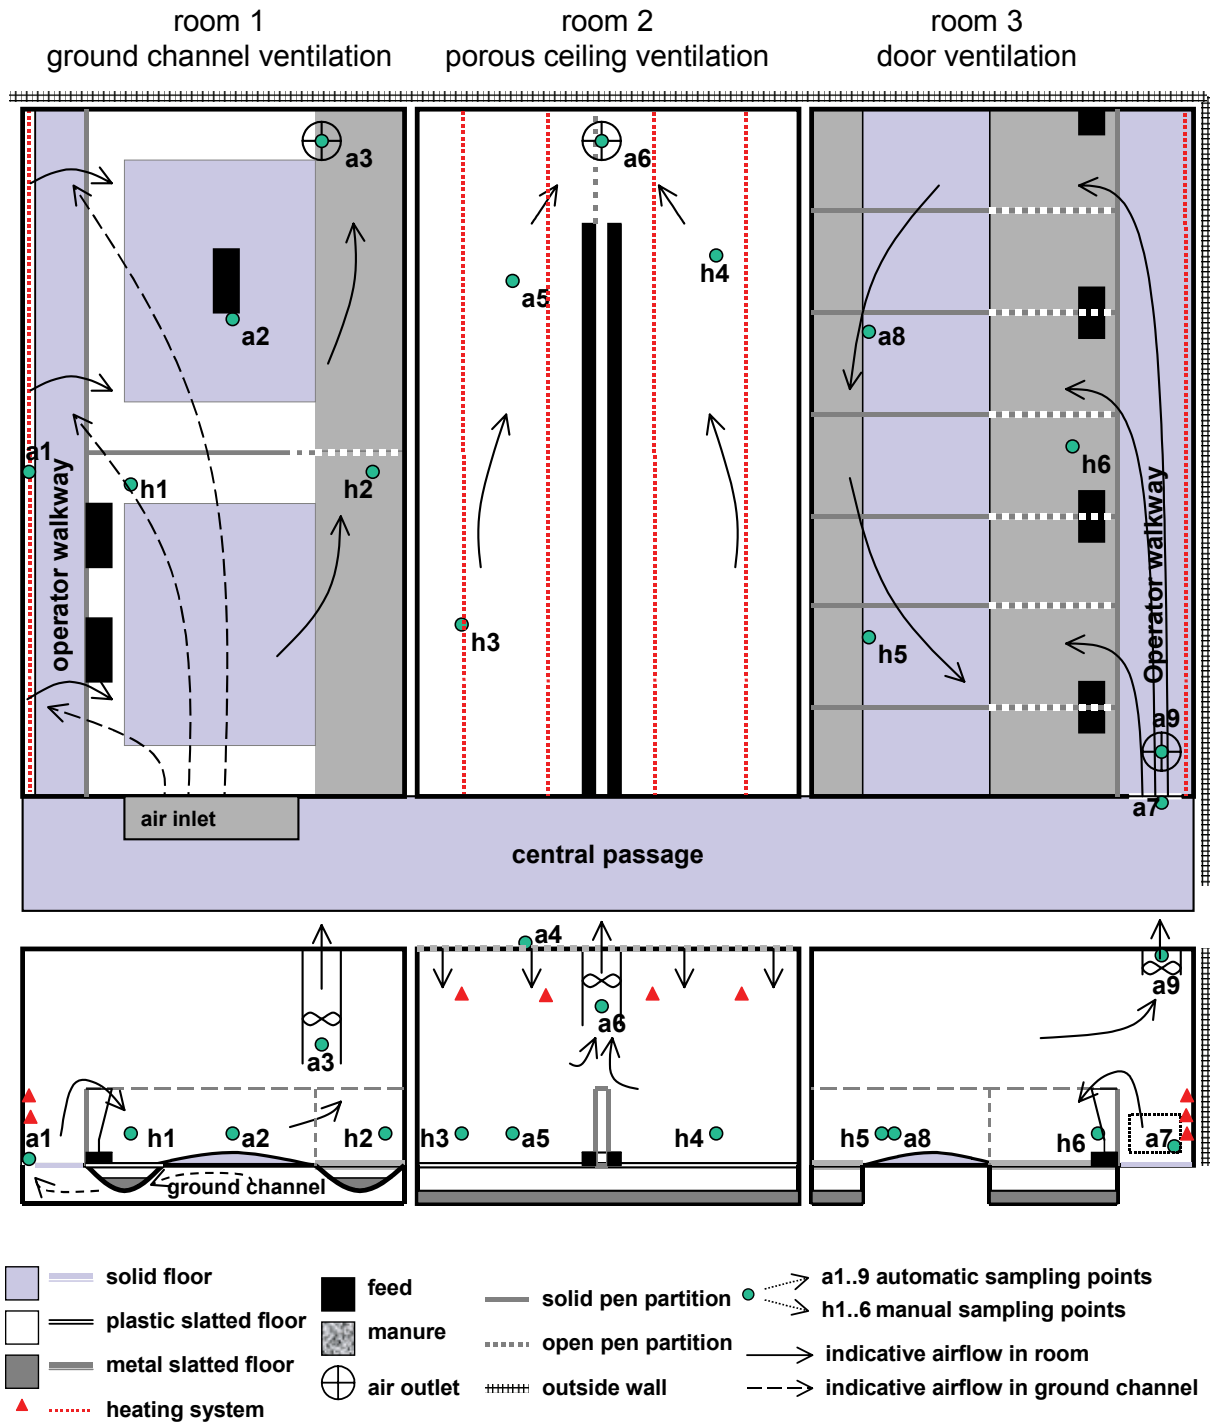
Plan and cross-section of the building with the three experimental rooms.
